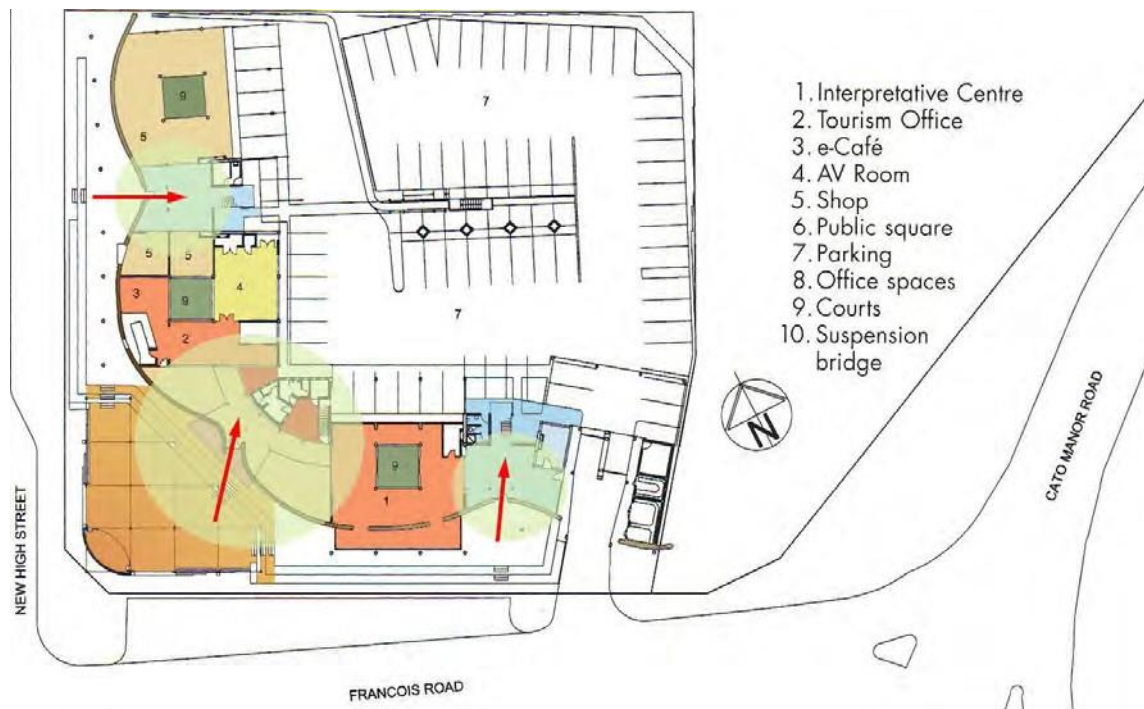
Ground Floor Plan of Intuthuko Junction. (Source: Phiri, 2014)
